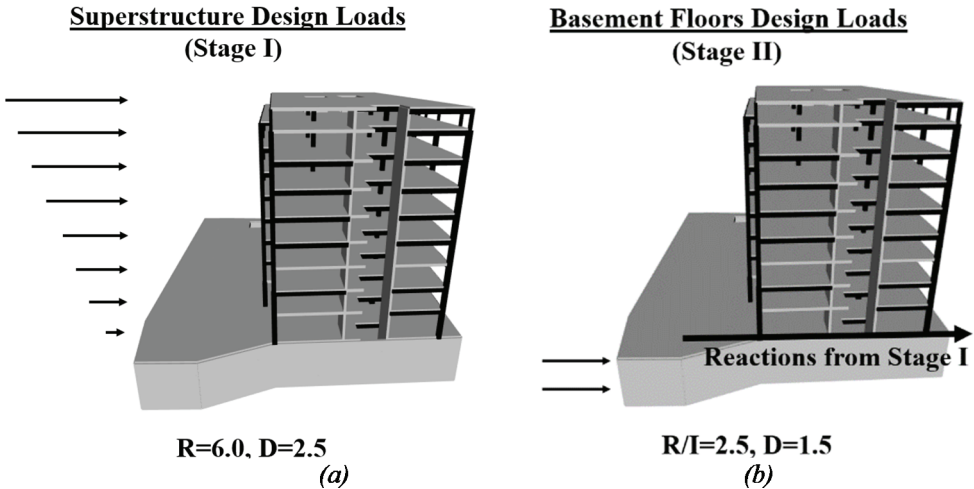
Calculation of design loads based on Section 4.7.5; (a) superstructure (b) basement floors.
